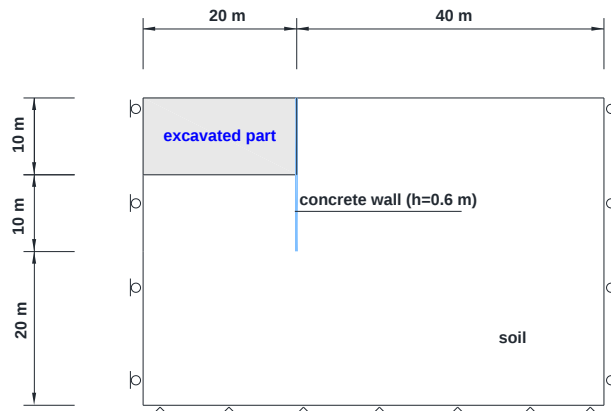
Excavation simulation and analysis of cantilevered retaining wall
